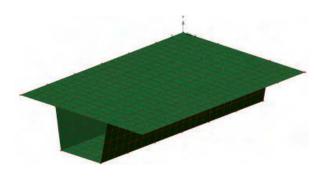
LUSAS MODEL, FE SHELL ELEMENTS MODEL FOR A TYPICAL BOX GIRDER
